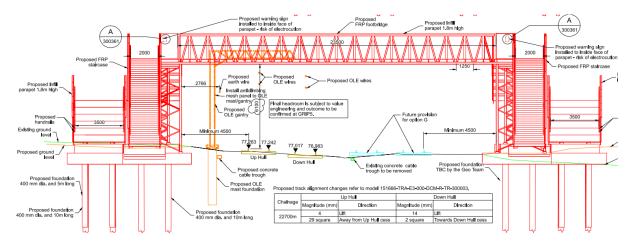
Proposed ramped and stepped bridleway bridge general arrangement drawing
